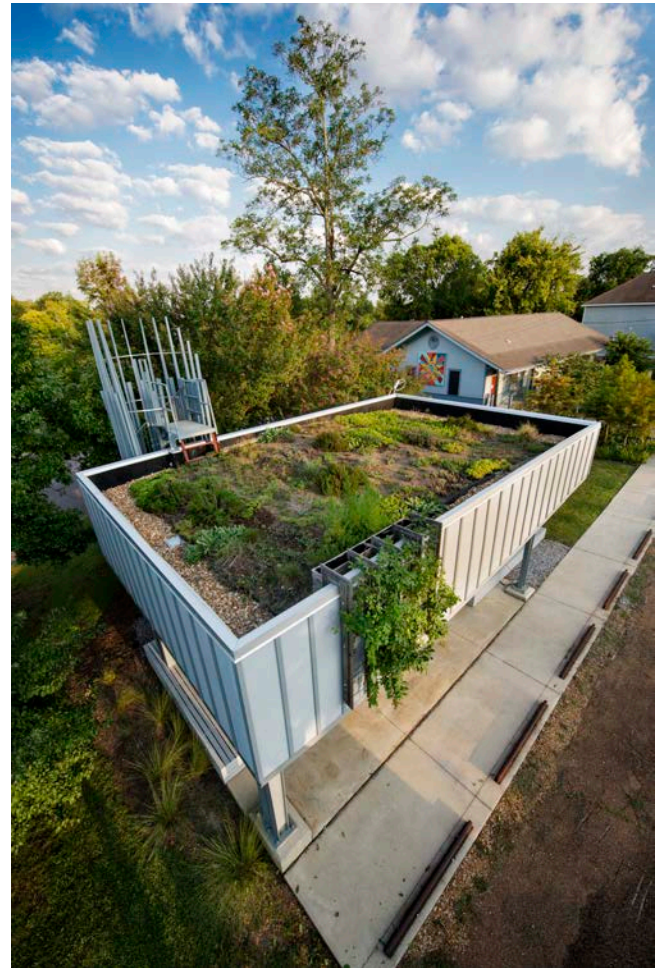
SuperUse Pavilion green roof and planted wall system hinting at what lies above.
